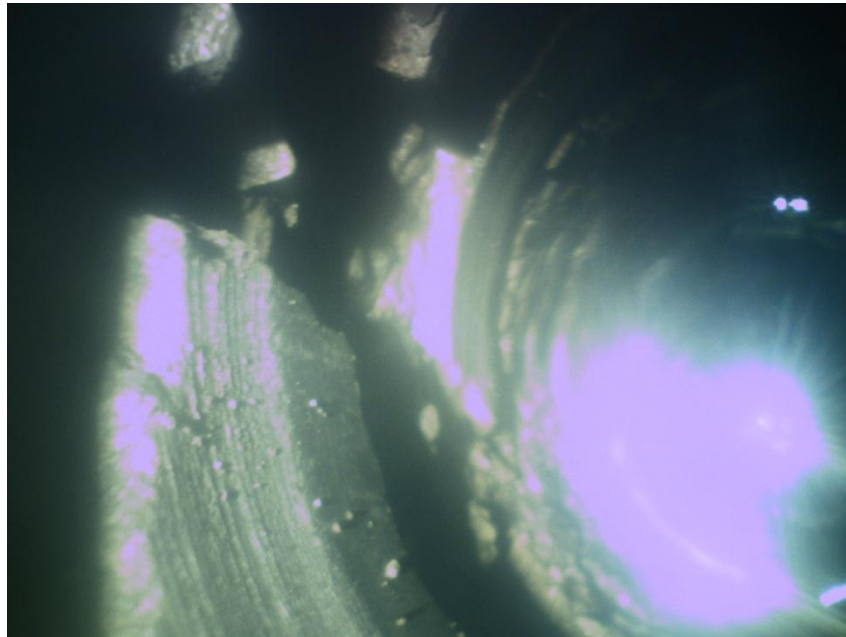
no cracking or fracture of the pier concrete noted inside the corehole
